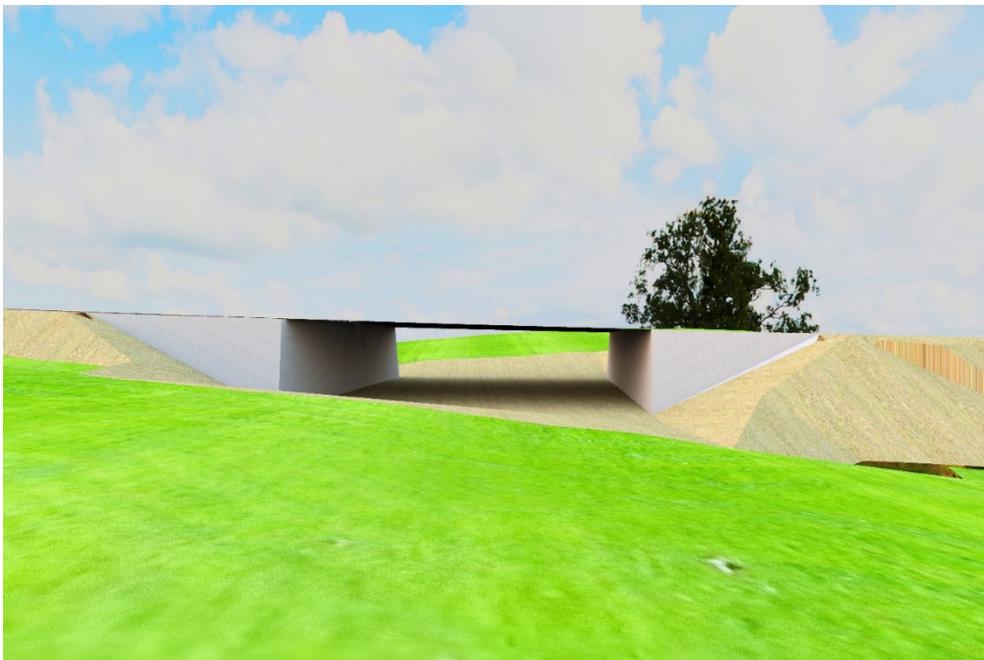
Simulation of Wildlife Underpass at MP 164.0, looking west.
